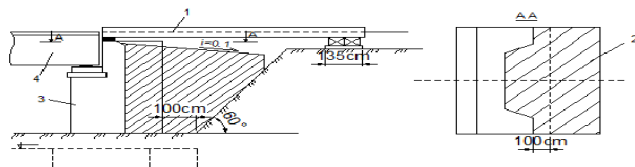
Simulation of abutment and retaining wall in front of abutment, avoiding abutment displacement
